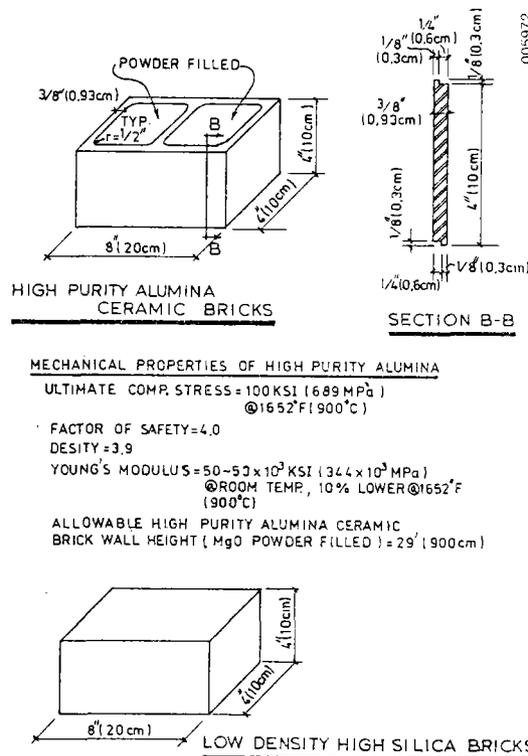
Details of Ceramic Bricks Used in Figure 5-7
